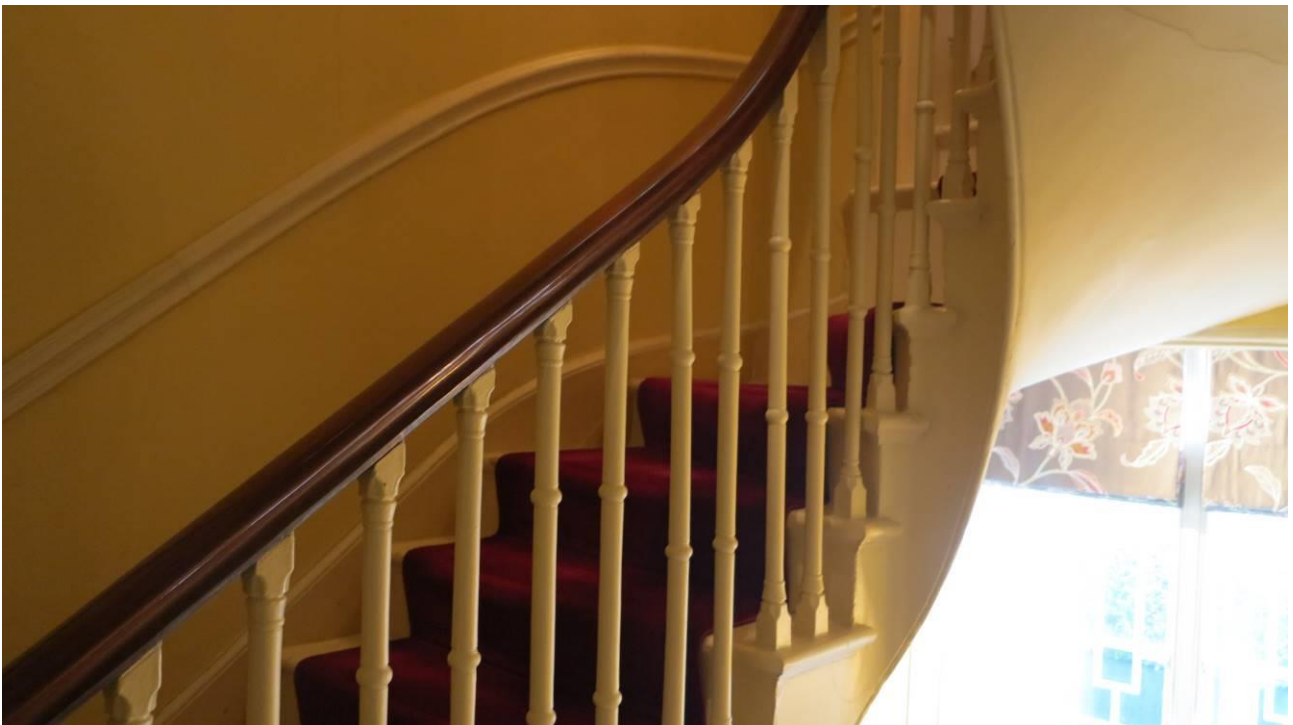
The main staircase, flight from first floor to second floor showing detail of balusters
